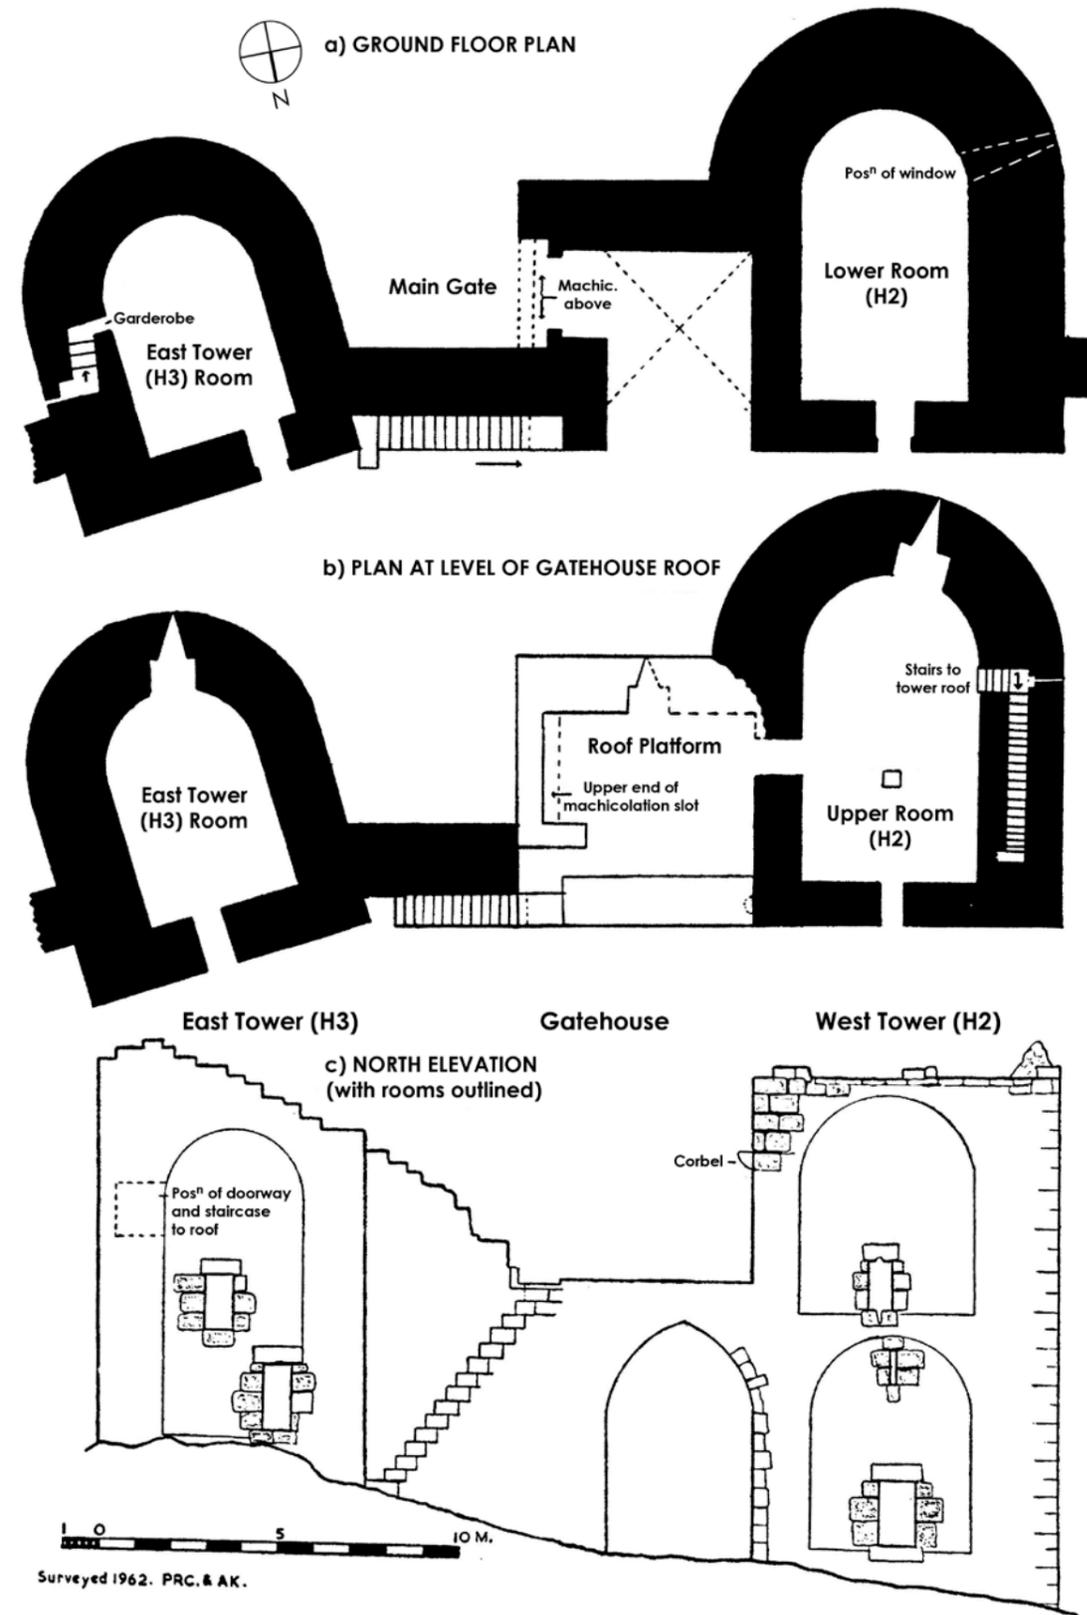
Plans and north elevation of the gatehouse (Source: Youngs, 1965, p. 129)
